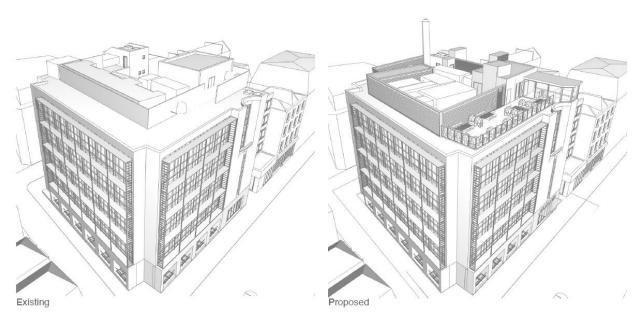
3D views of existing and proposed scheme (source: BMJ Architects, 2021)
